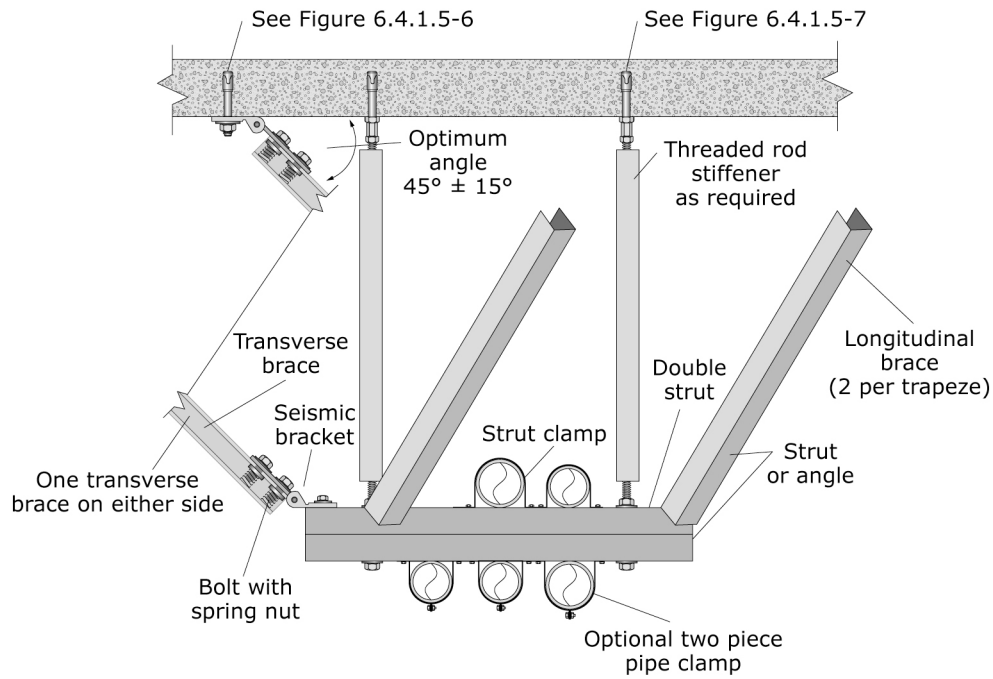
Rigid bracing - Trapeze supported piping (ER).
